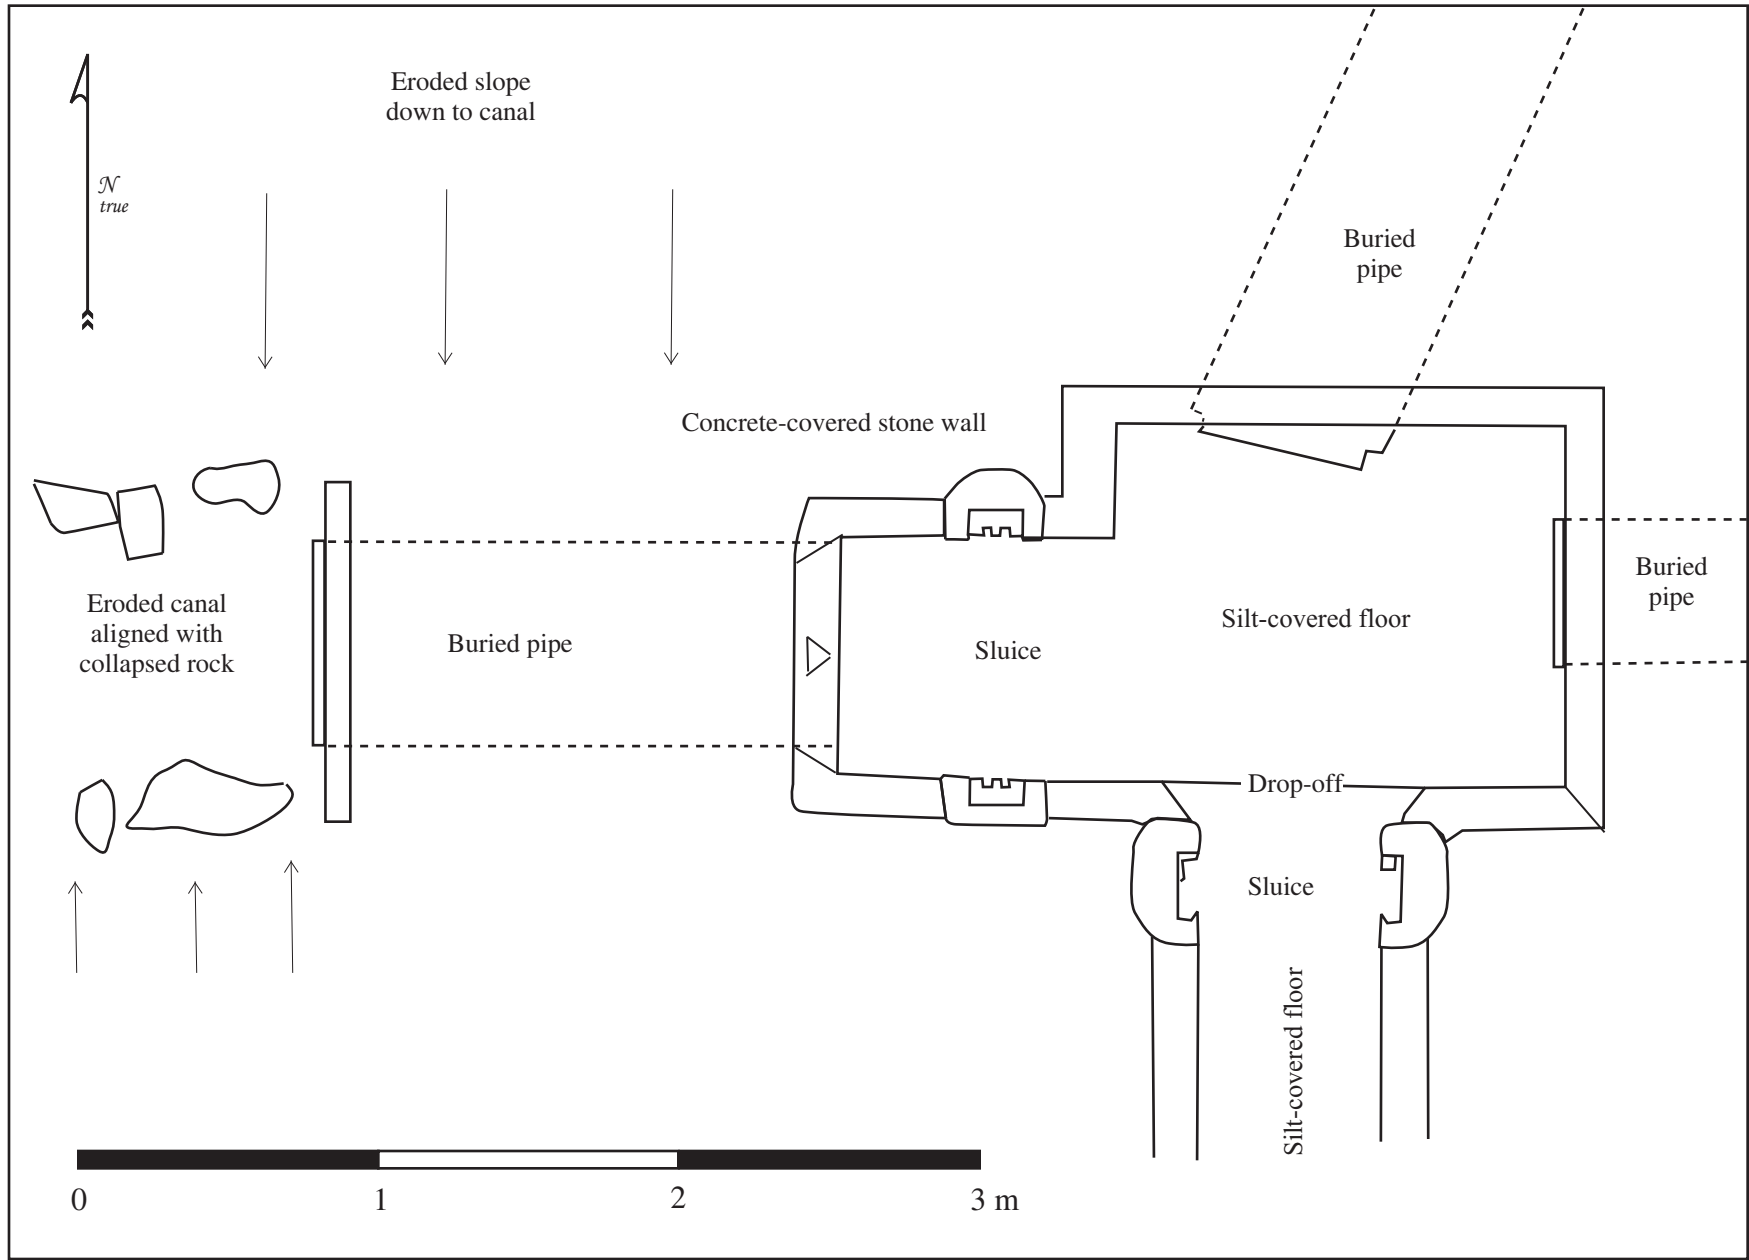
Site 7159 Section 12 sluice gate complex plan view.
